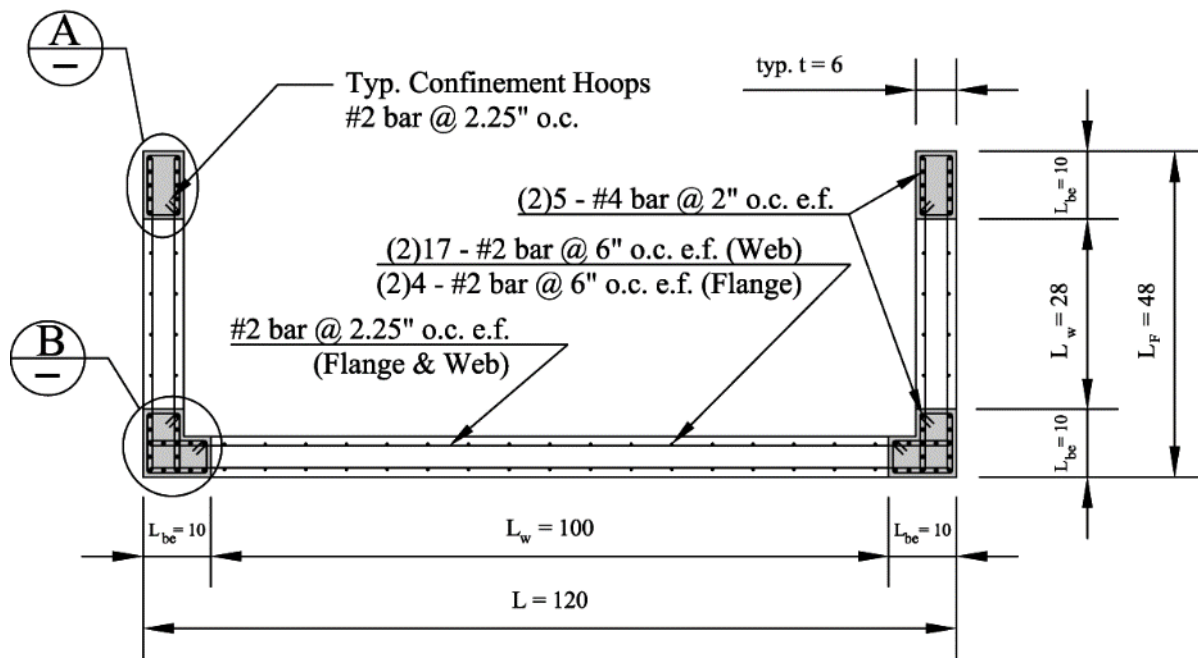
CWall6,7,8 Overall Wall Geometry and Reinforcement Layout (Units: inches)
